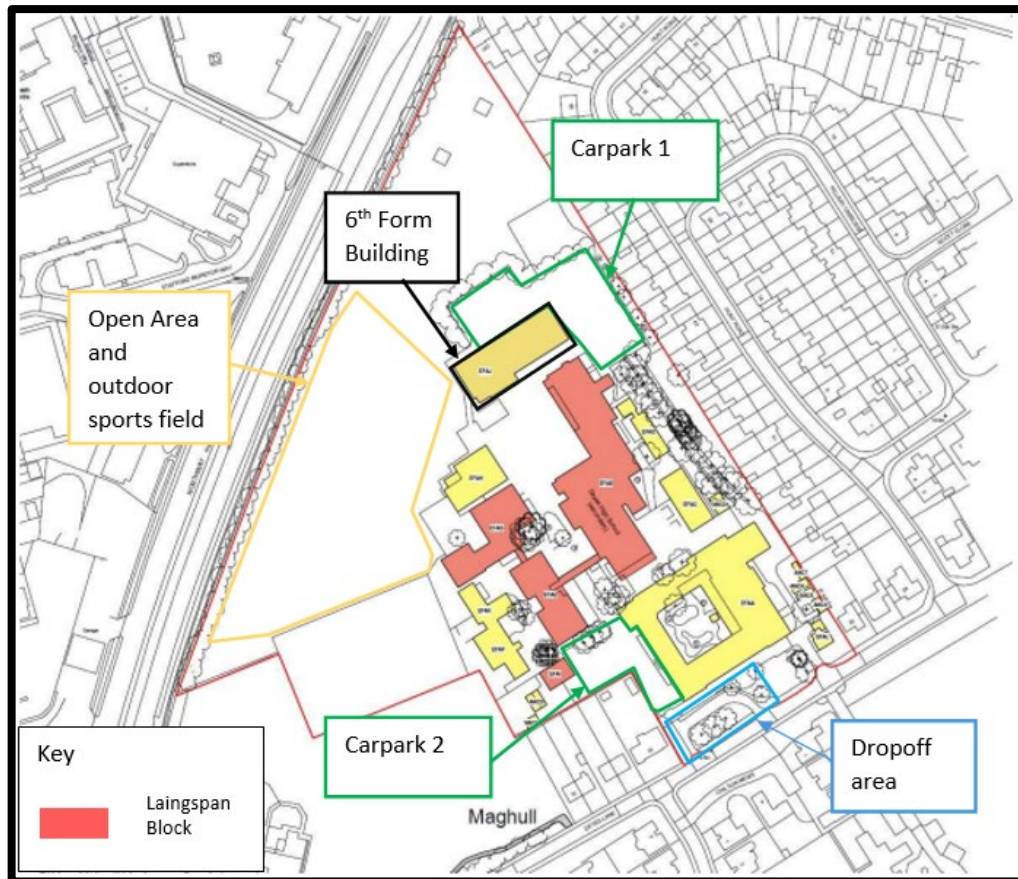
Deyes High School Laingspan Building Location (from DFE)
